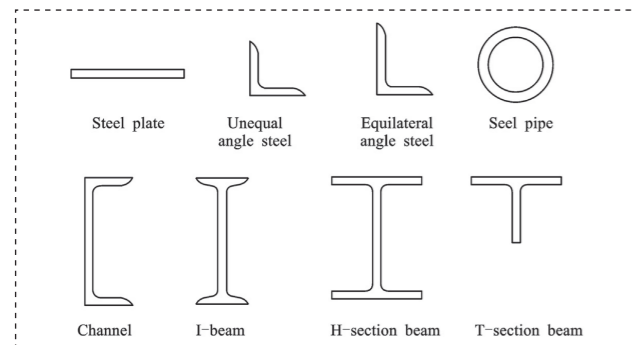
Cross section types of steel section (Source: Elsevier, 2022)
